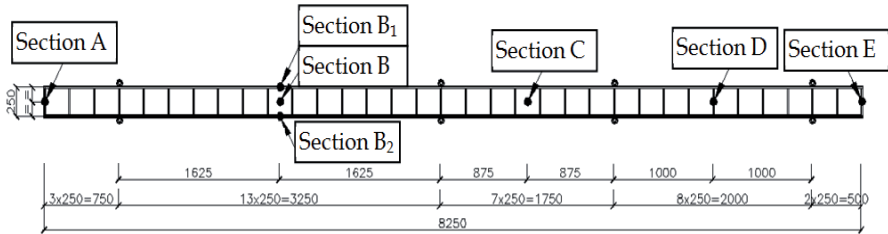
Tubular composite (steel-concrete) footbridge investigated sections.
